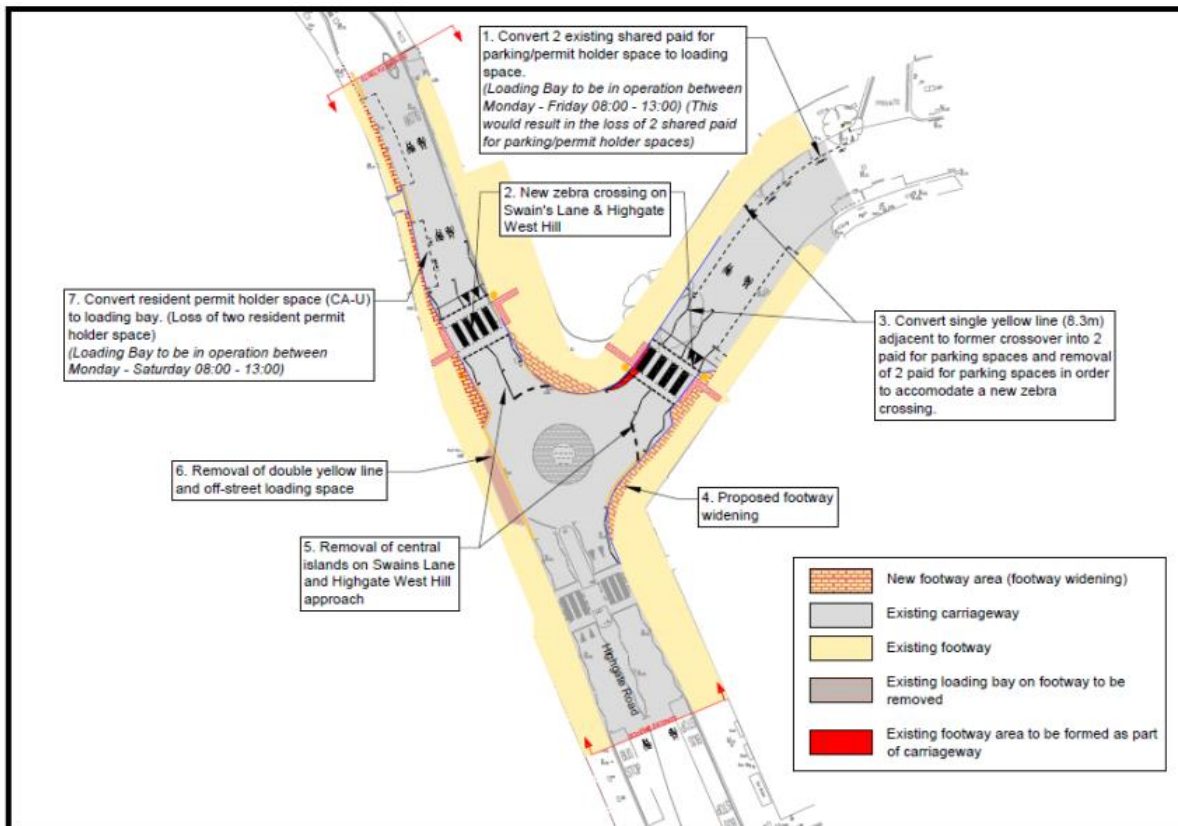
Approved plan for junction changes at Swains Lane, Highgate West Hill and Highgate Road
